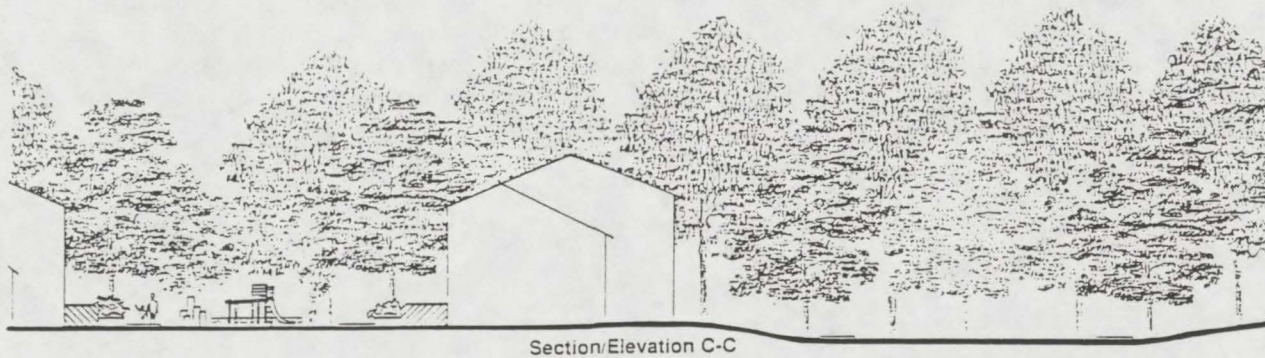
Drawing by team four showing connections between townhouse units and outdoor spaces.
